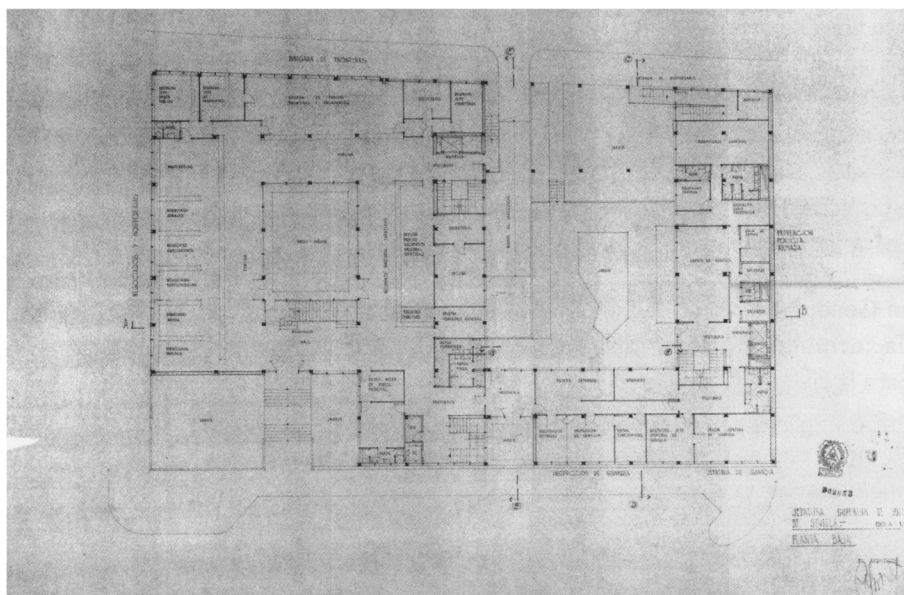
Original floor plans in 1961 (Source: Ramón Montserrat)
